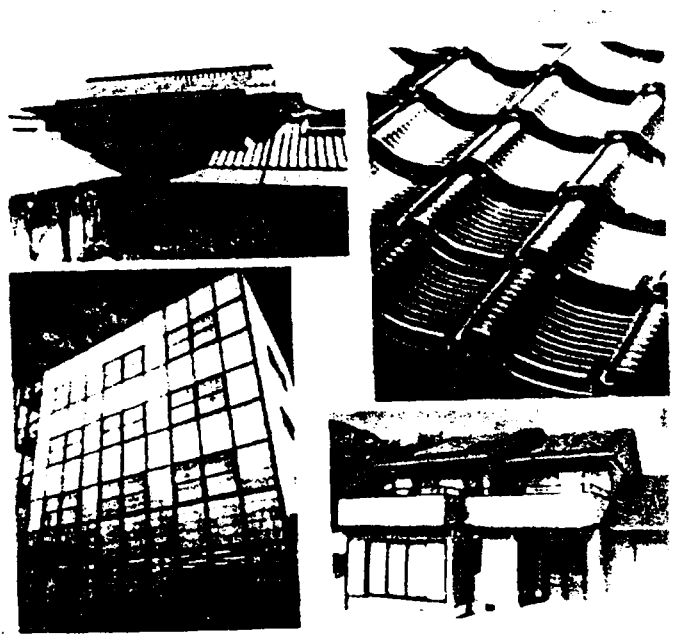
PV in buildings - some examples of roofing tiles and building wall cells in Japan
